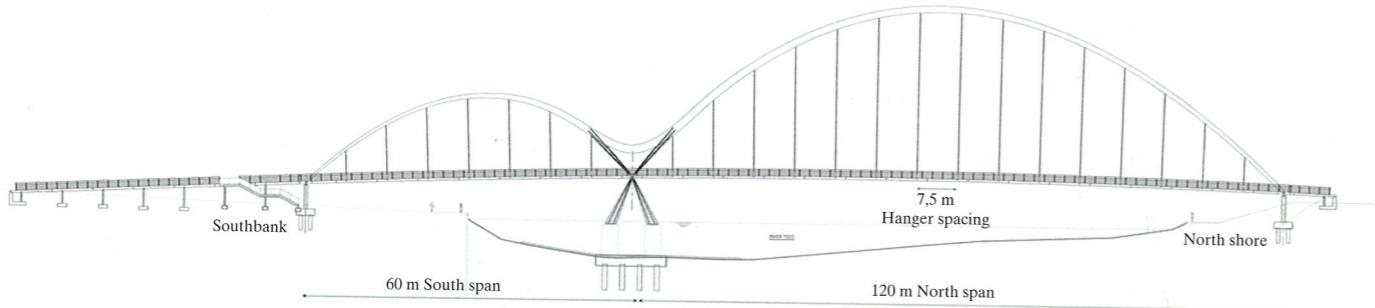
Infinity Footbridge, Stockton-on-Tees. Elevation
